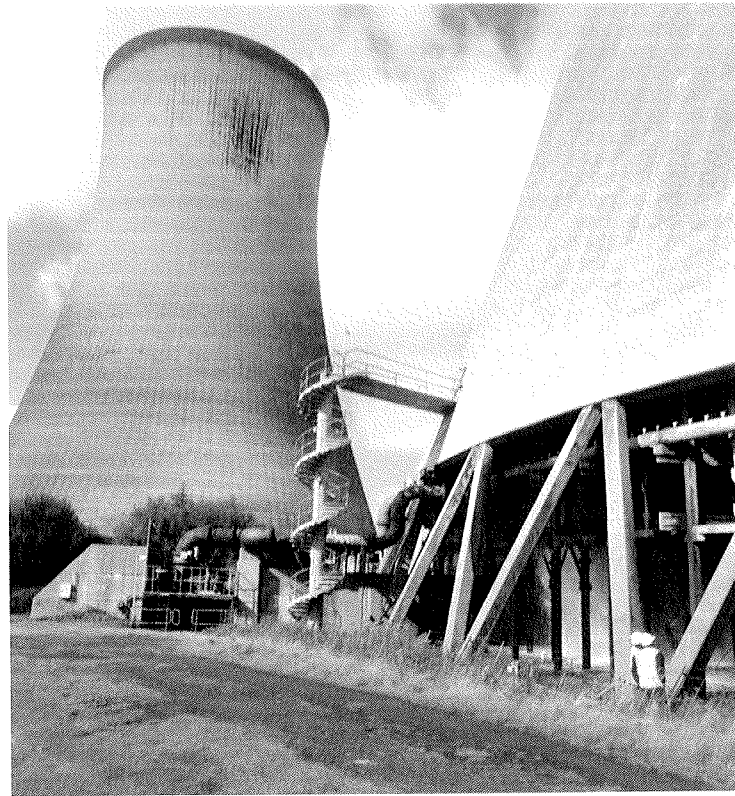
North 2 tower to the left: the only tower retaining Baltic redwood timber slats, which are replaced when rotten. The slats have been replaced with plastic in the five remaining towers.
